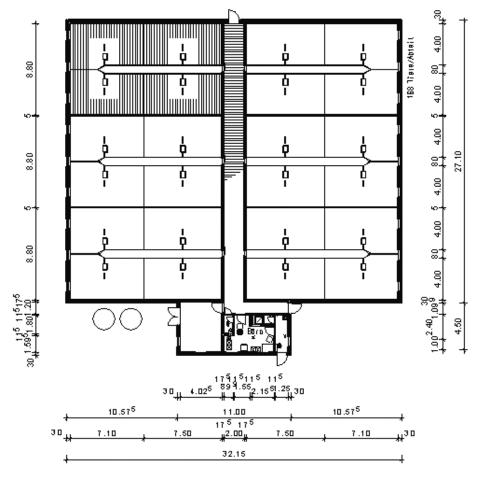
CAD screen: Floor plan of a 1000-slot fattening pig barn.
